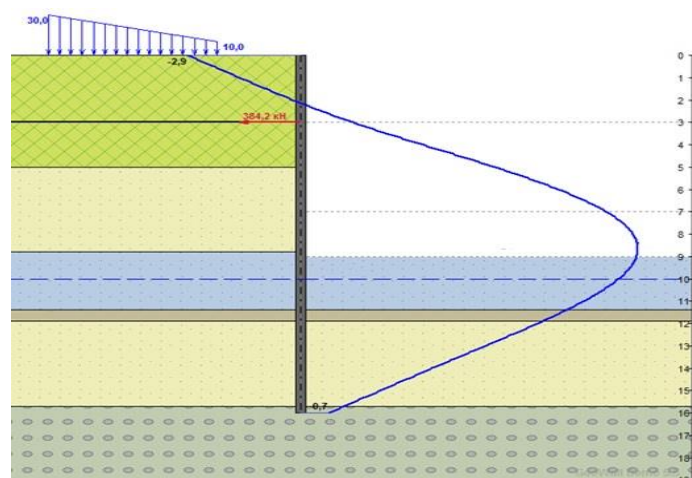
Design of sheet pile quay wall with one horizontal anchor
